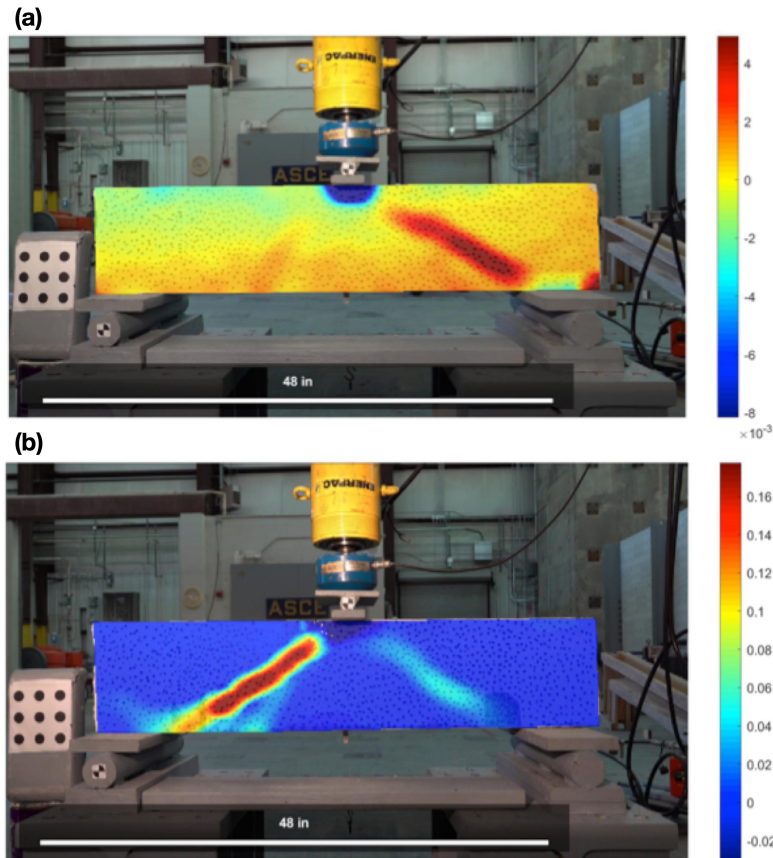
Behavior of epoxy-repaired reinforced concrete beam via DIC: (a) at major crack development; (b) at failure. Values in inches.
